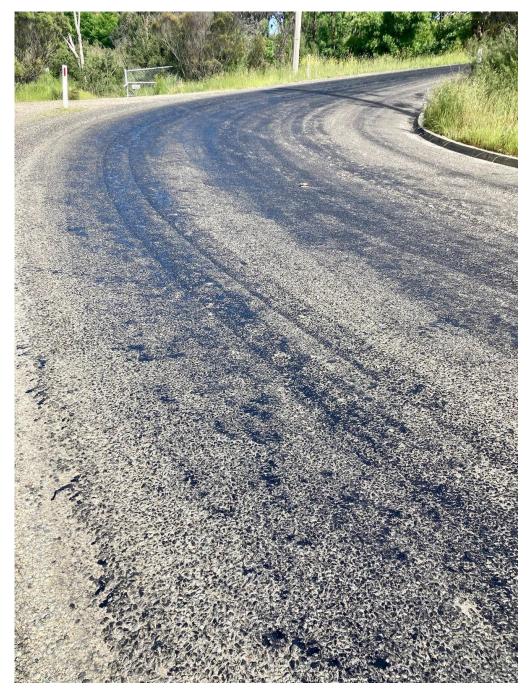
Damage to Wickerslack Lane road surface, birth of the new La Brea Tar Pits. In the center of the photo is the entrance to my property at 133 Wickerslack.
